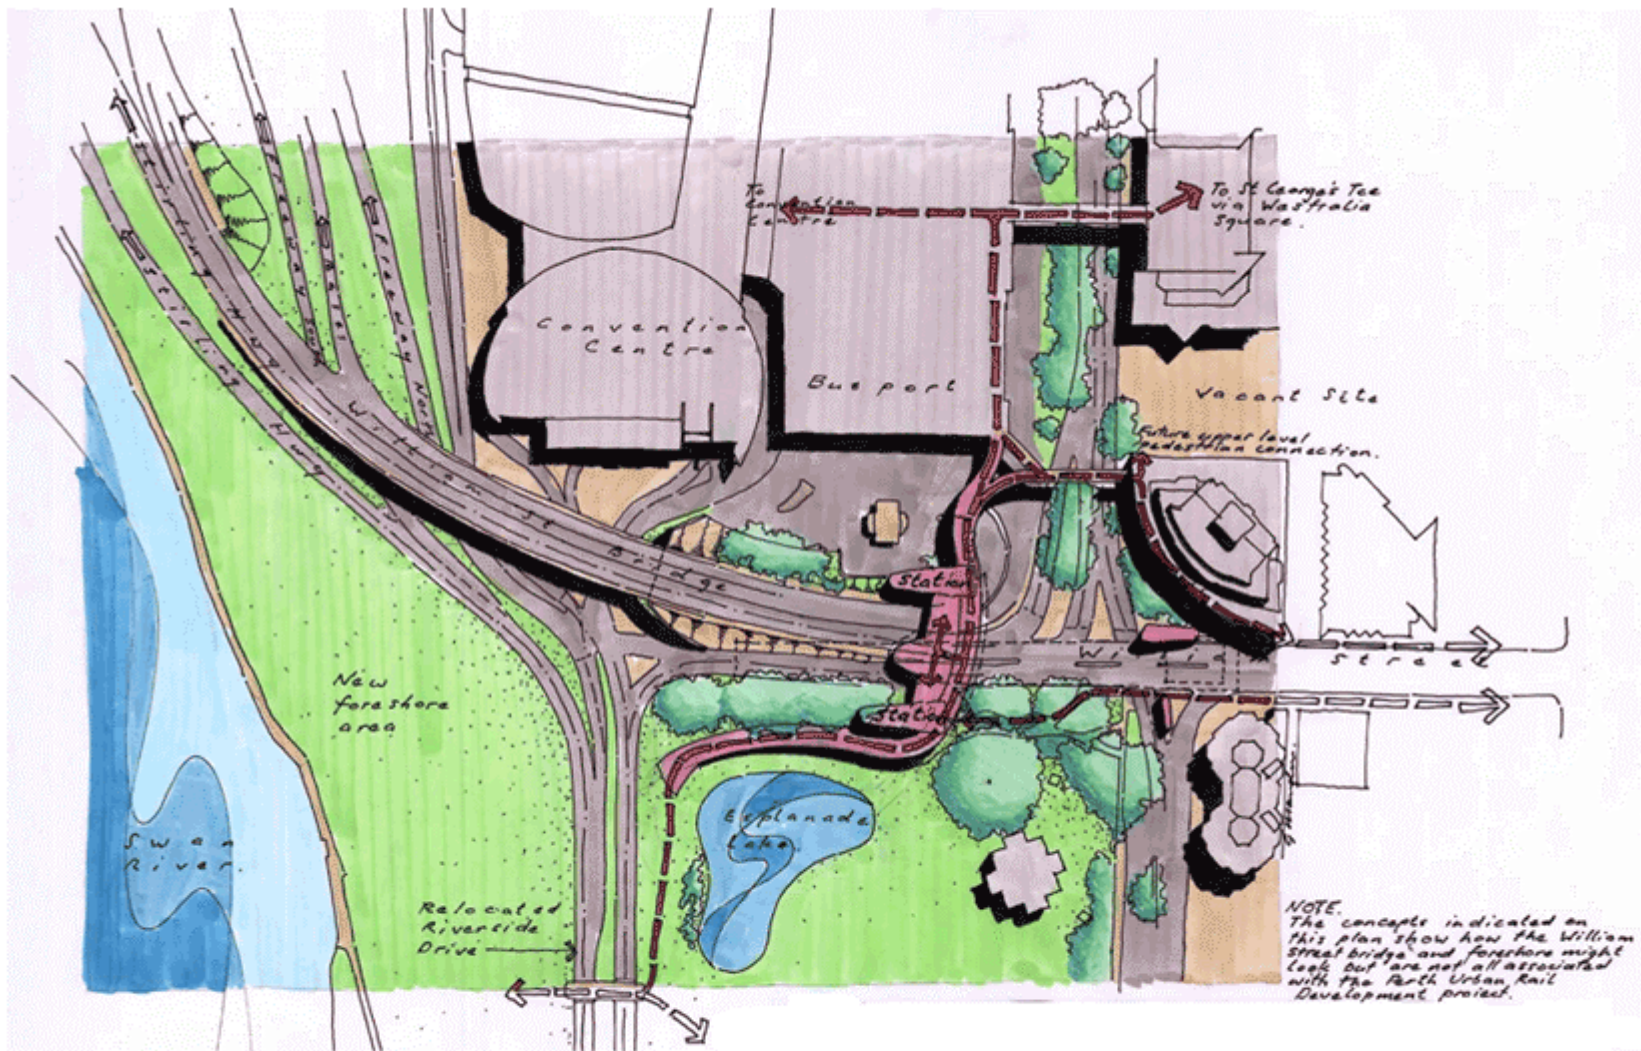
Concept Plan of New Esplanade Station Pedestrian Access
